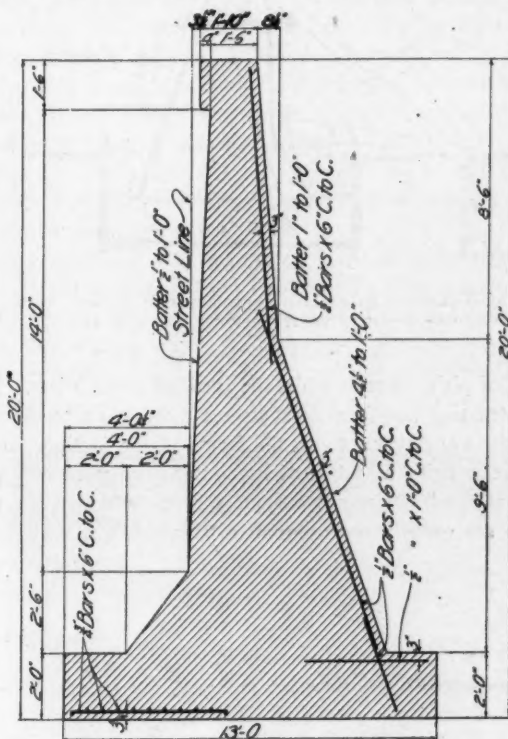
SECTION OF RETAINING WALL, ROADWAY CONCRETE CONSTRUCTION, C., B. & Q. RY.
